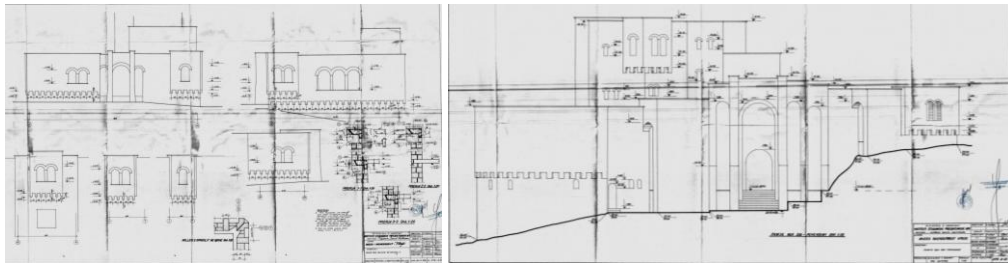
(Left: façade fragments and details), Right: main façade) ; (Archive of the Construction
